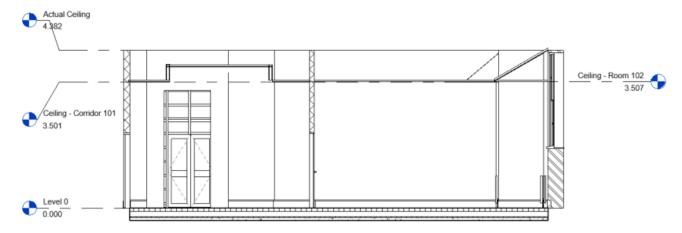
Cross section of ceilings from Corridor 101 to Lift corridor to Room 102
